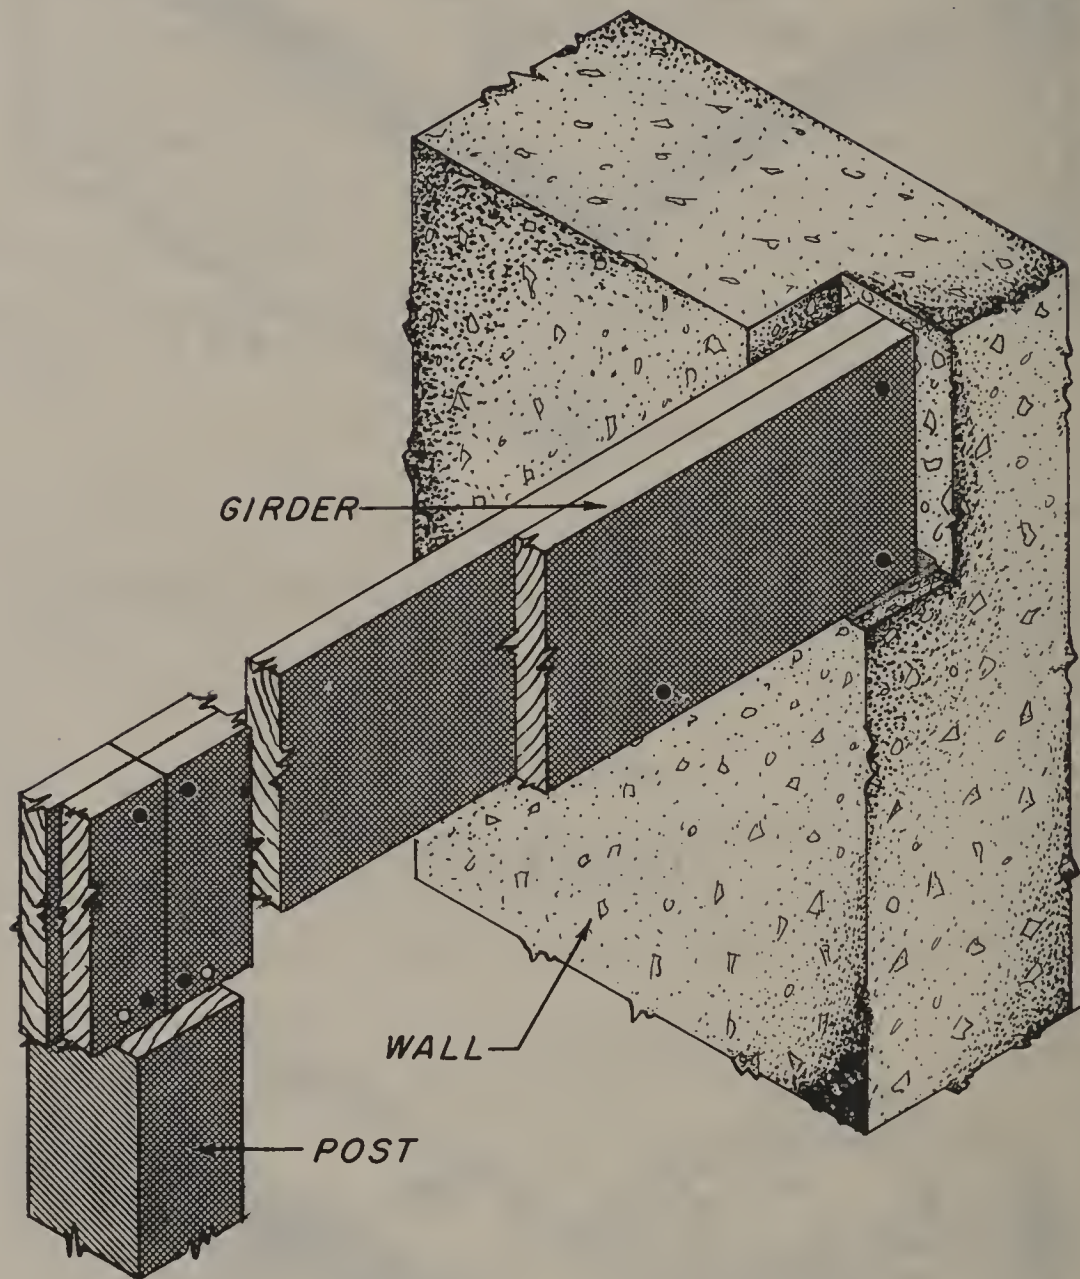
Two-piece girder. Nailed from one side with tenpenny nails, two in each end of each piece, others staggered with a horizontal distance of 16 inches between nails. Alternate construction—nailed from each side with tenpenny nails, two near each end of each piece, others staggered with a horizontal distance of 32 inches between nails. Girder toenailed to post with two tenpenny nails on each side. Note: Girder joints should occur only at supports.
